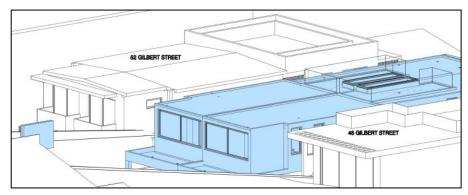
Proposed 9am sun's eye diagram overshadowing 52 Gilbert St.
